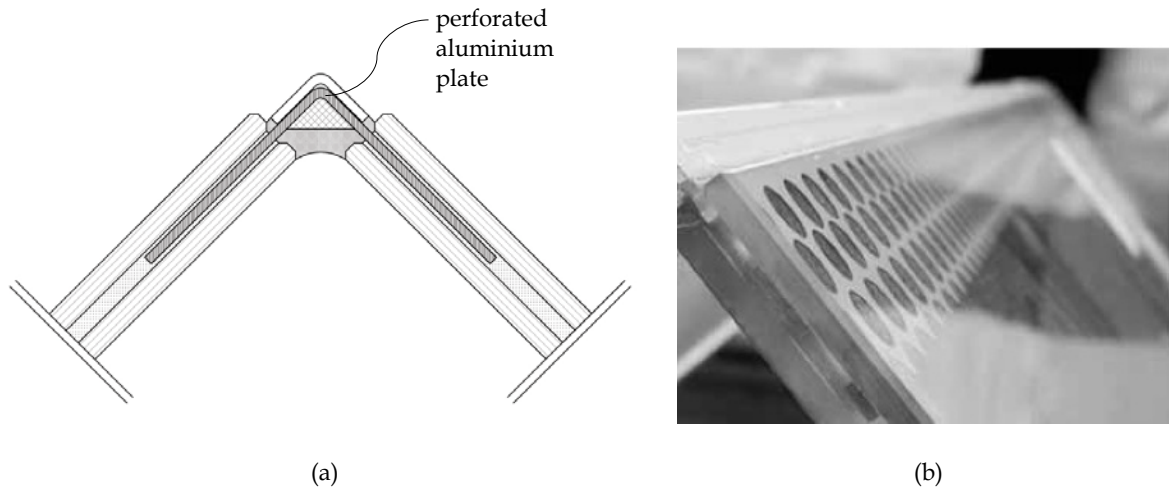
Cross-section view of the folded glass roof embedded connection developed by Willareth (a) and photo of prototype (b).
